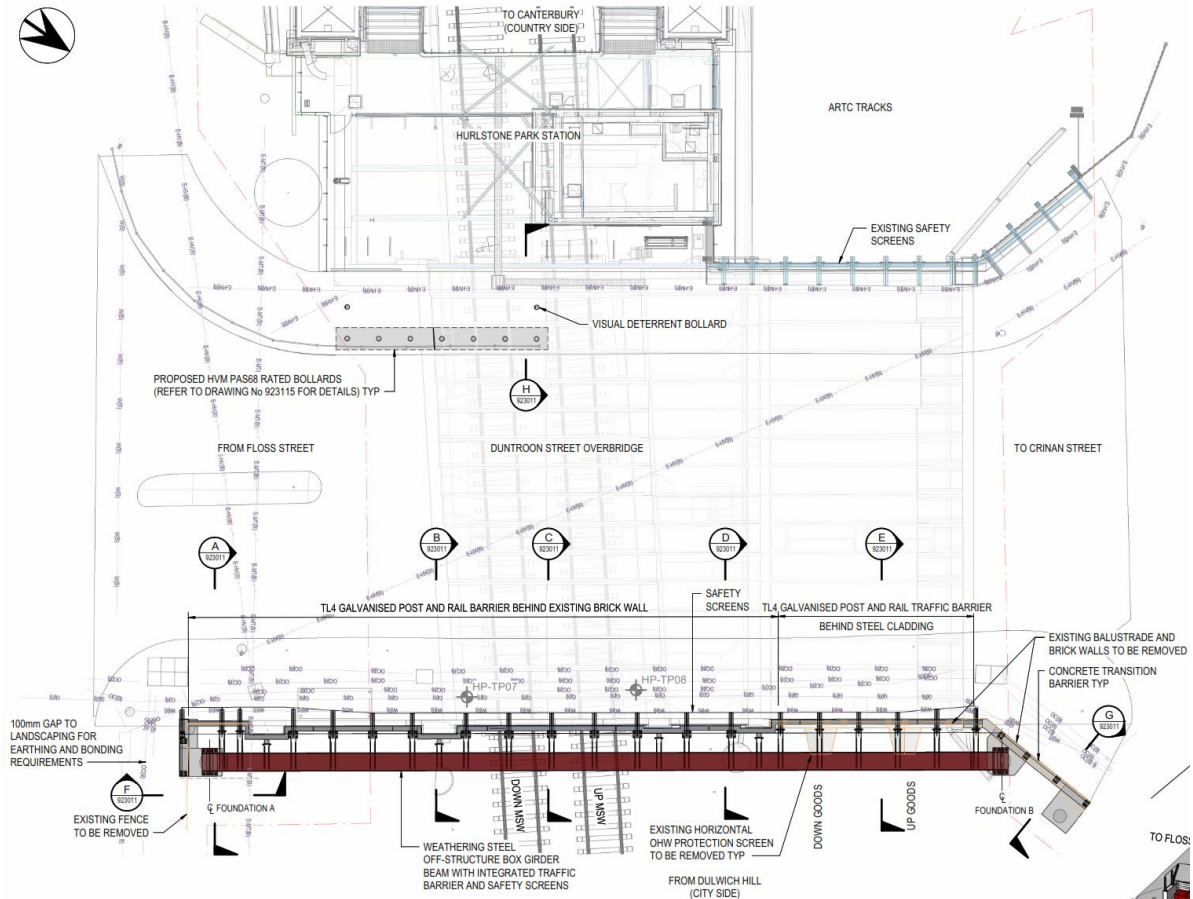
Plan of treatment works for Duntroon Street Bridge (Source: Aurecon 2024, provided by ARCH Artifex)
